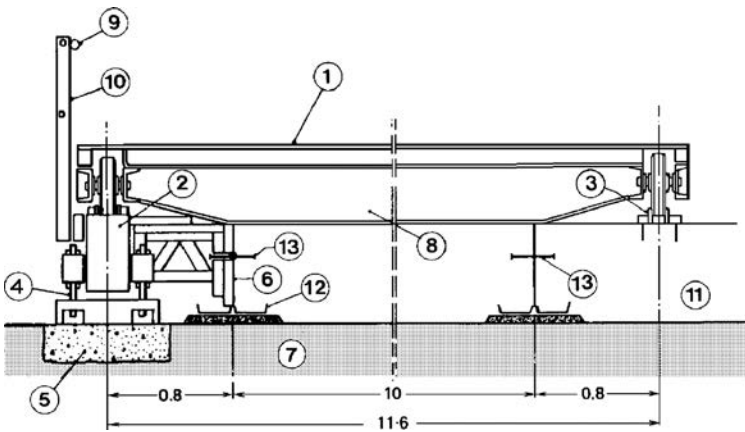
Layout of equipment for the construction of the slabs of facing. (1) Slipform – basic frame; (2) rail beam; (3) rail; (4) screw for centring the rail; (5) concrete plinth block; (6) lateral formwork; (7) mortar bedding; (8) regulating guide; (9) cable in protective tube; (10) railing; (11) cast slab; (12) waterstop at bottom; (13) intermediate waterstop.
